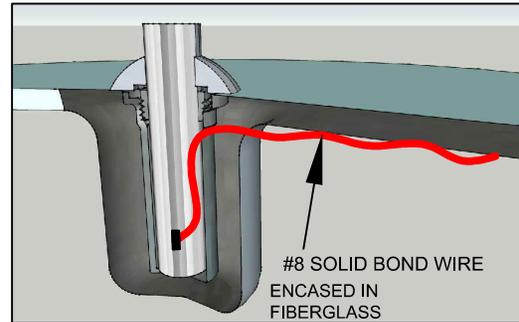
DETAIL REFLECTS ANCHOR INSTALLATION IN NESPA SHELLS ONLY.
